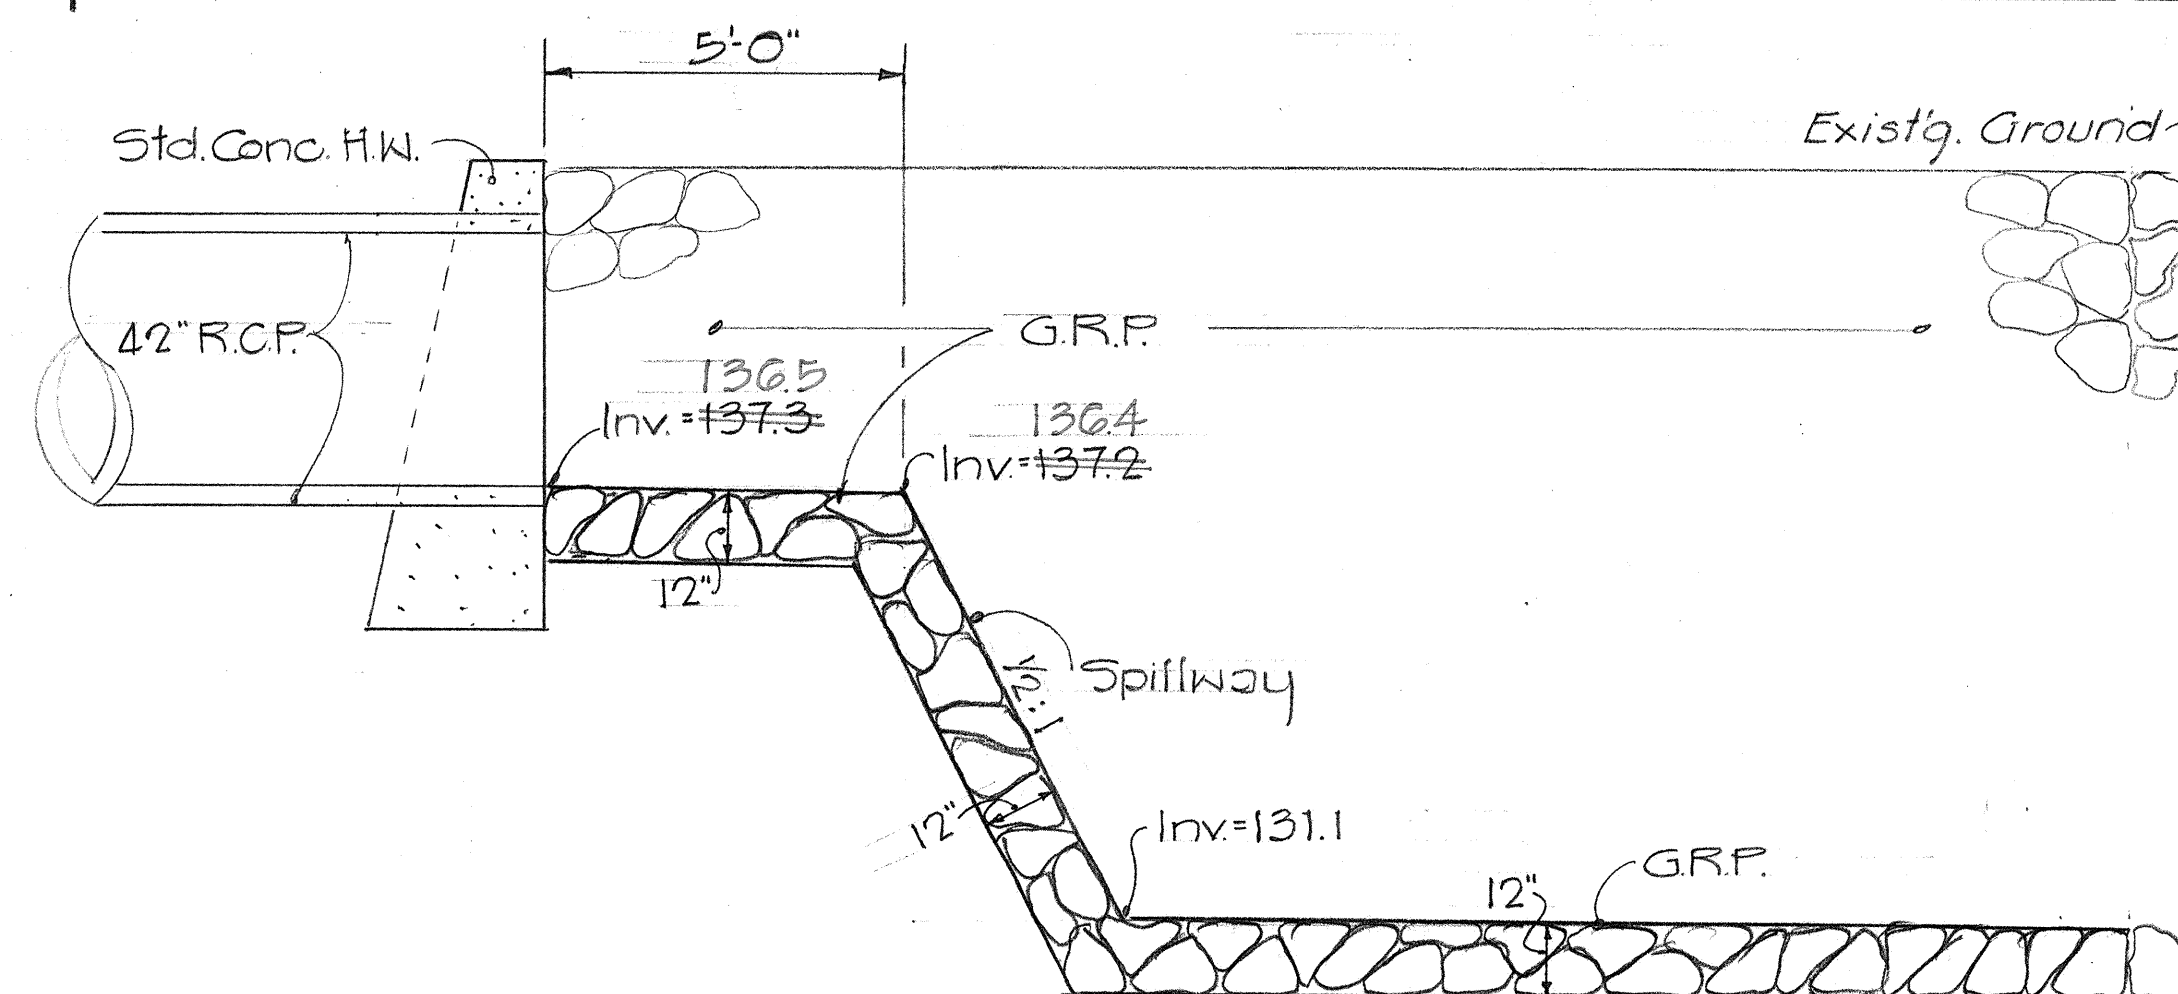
'-43" x 27" ARCH CULVERT OUTLET G.R.P. EROSION PROTECTION ~ STA. 1+52 % 58' RT.
